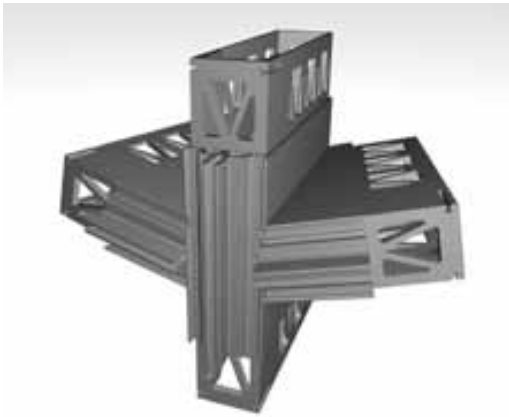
Rendering of Nematox I façade node by Holger Strauss [129]; the first AM structural node for freeform metal and glass construction. Design for stick-built aluminium façade system and equipped with standard connections, and integrated screw channel and gasket rebates. (Image source: [129])
